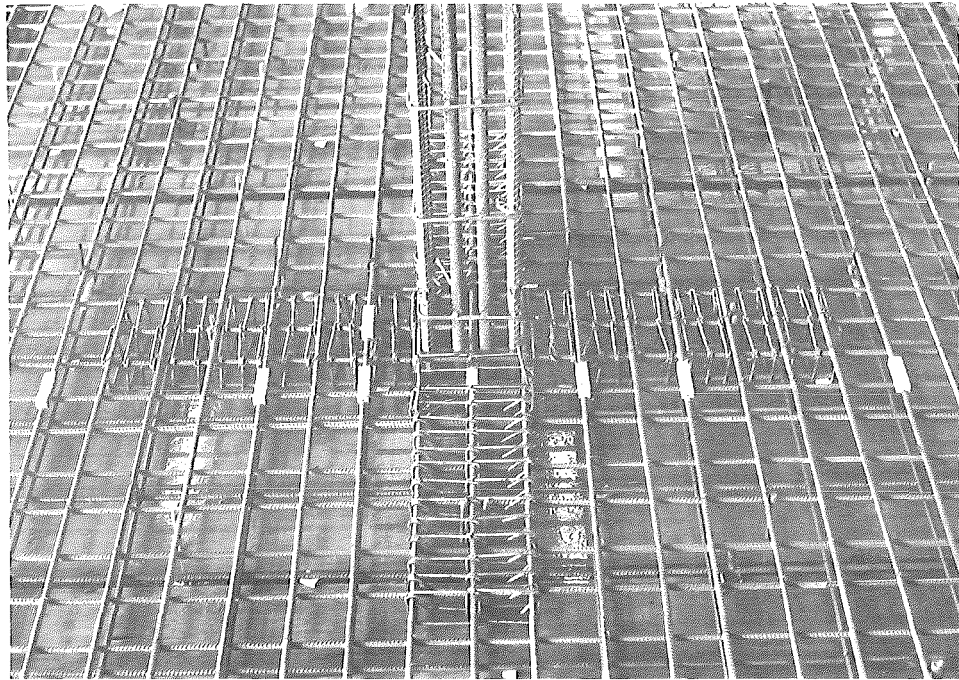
CLOSED STIRRUPS IN SPECIMEN 6CS
